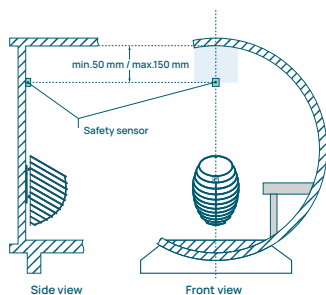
Installing the safety sensor on the wall in barrel saunas: wall-mounted heater
